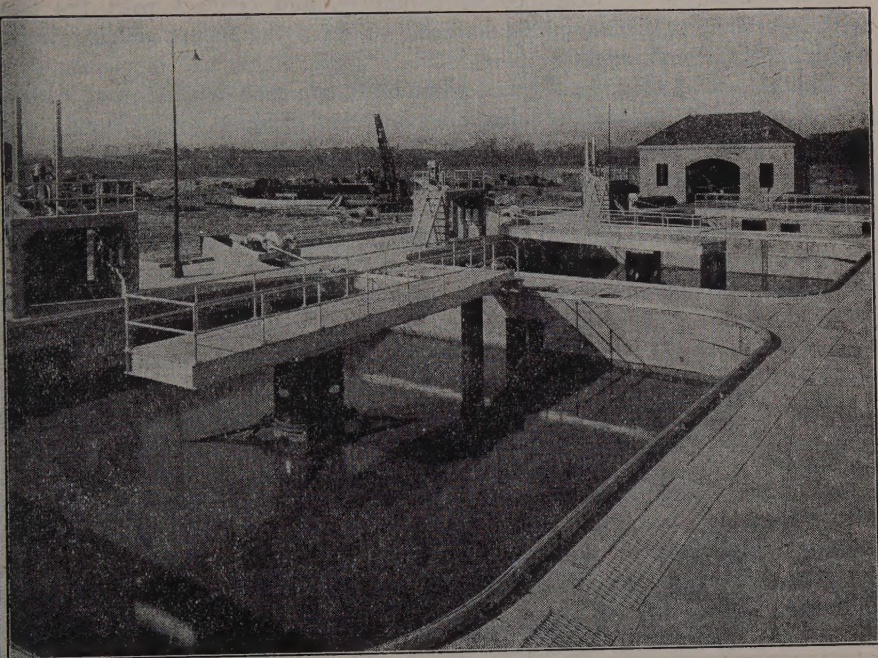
VIEW FACING WEST TOWARD GRIT CHAMBERS AND GRIT CONTROL BUILDING
